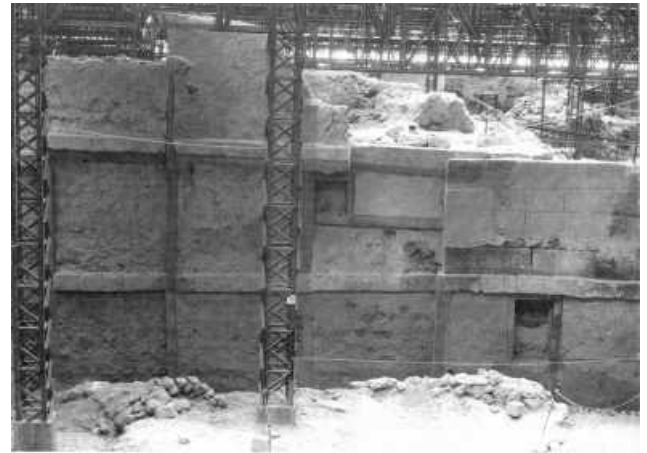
Xeste 2, north façade (Palyvou, 1999)
